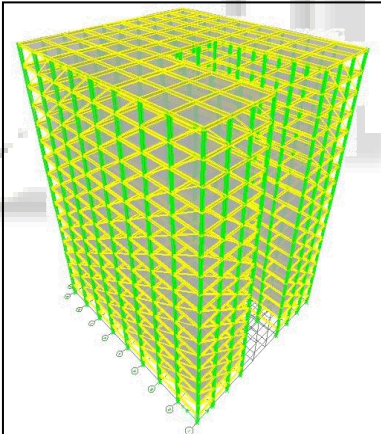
3D model of G+16 storey building with Diagonal 1 bracing
